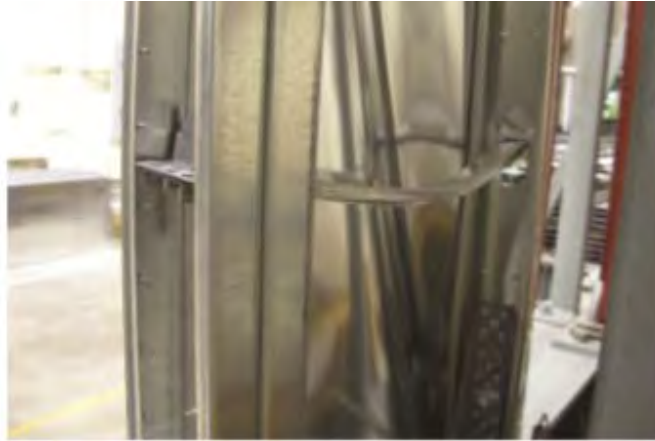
Buckling of bridging in CFS framed and sheathed shear wall (Balh (2010)).
